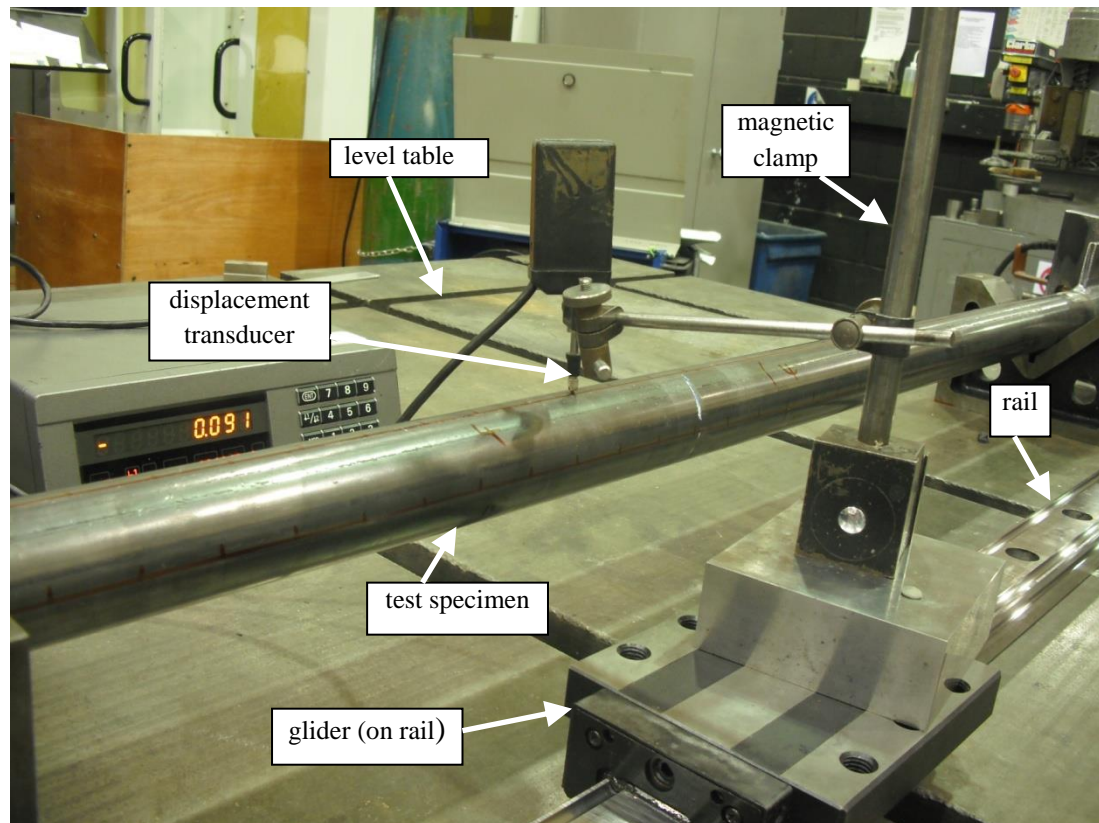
Set-up for measuring global imperfections of bracing test-specimens
